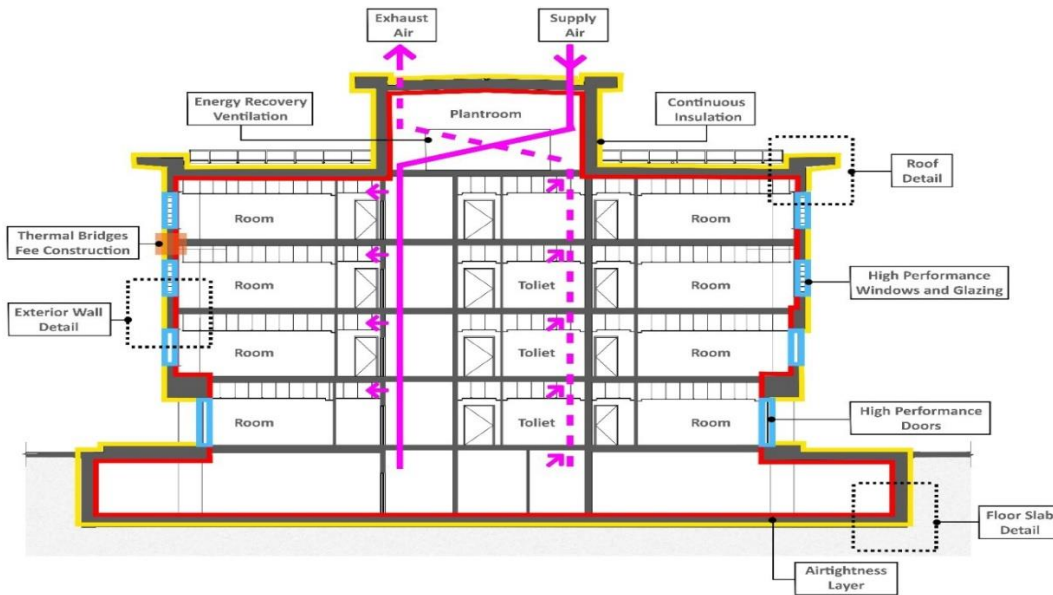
shows cross-section drawing for new office building in CFC using PH principles. Author (2021)
